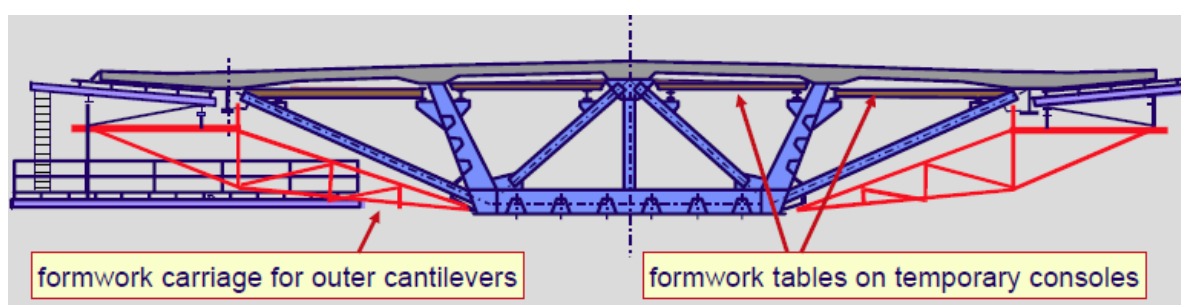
Scaffold erection under the composite structure, by means of formwork carriage – box section
